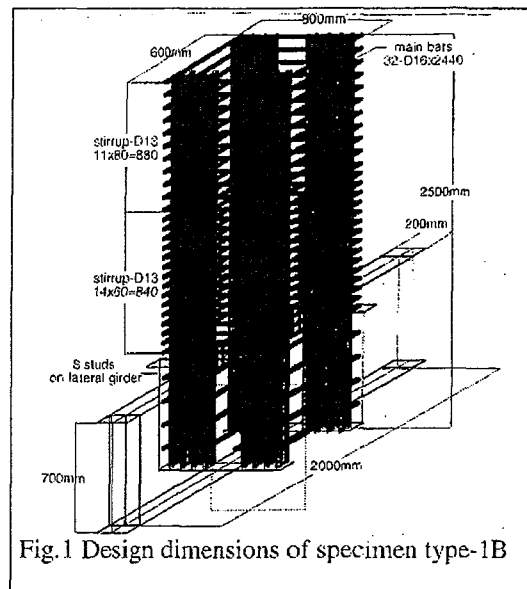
Design specifications structure consisting of steel girder-reinforced concrete pier composite connection
